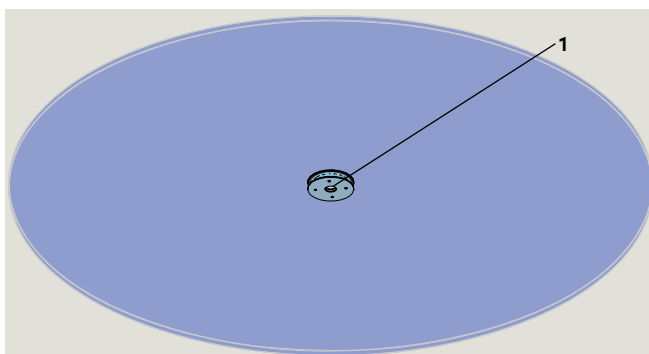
Canopy glass with bearing assembly, bottom view
